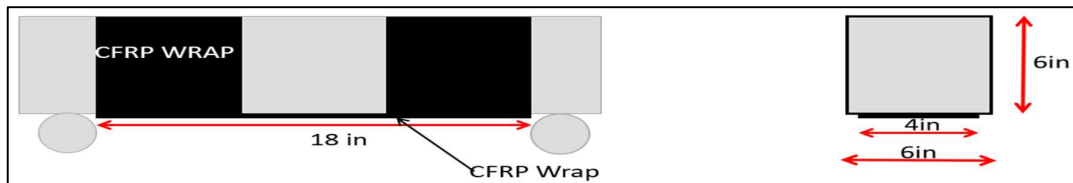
Bottom view of beams strengthened by CFRP wrap
